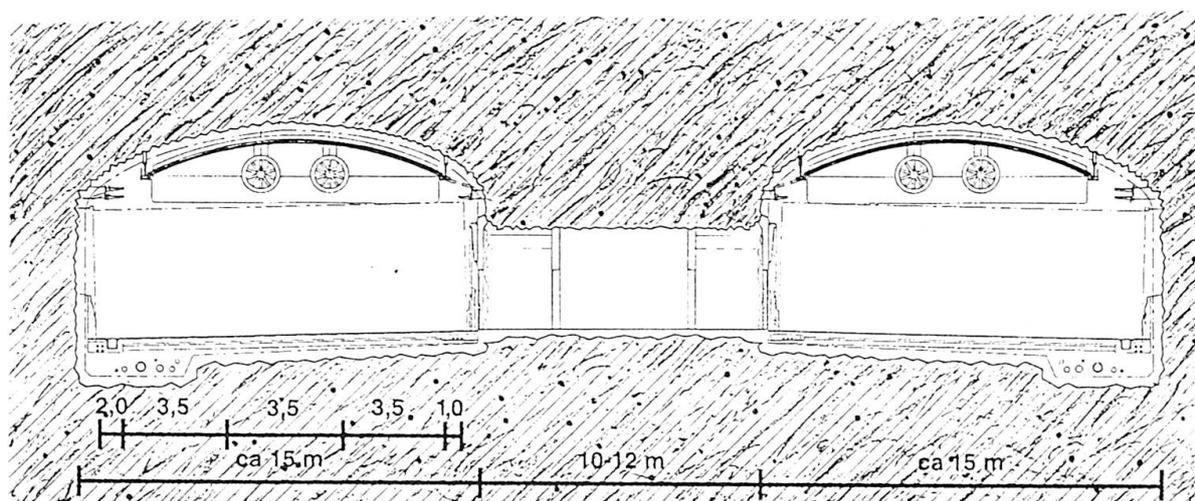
The main tunnels are housed in two parallel tubes. This drawing illustrates a section where there are three carriageways in each tube as well as an emergency evacuation passage running between the two tubes.
